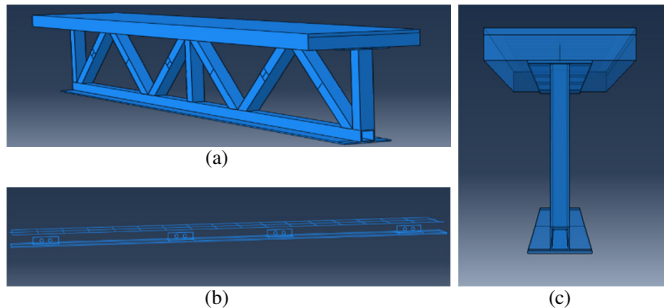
Assembling of SCTG models: (a) 3D view of the single composite truss girder, (b) top PRL with the BRC 300 × 150X6 mm, (c) specimen front view.
